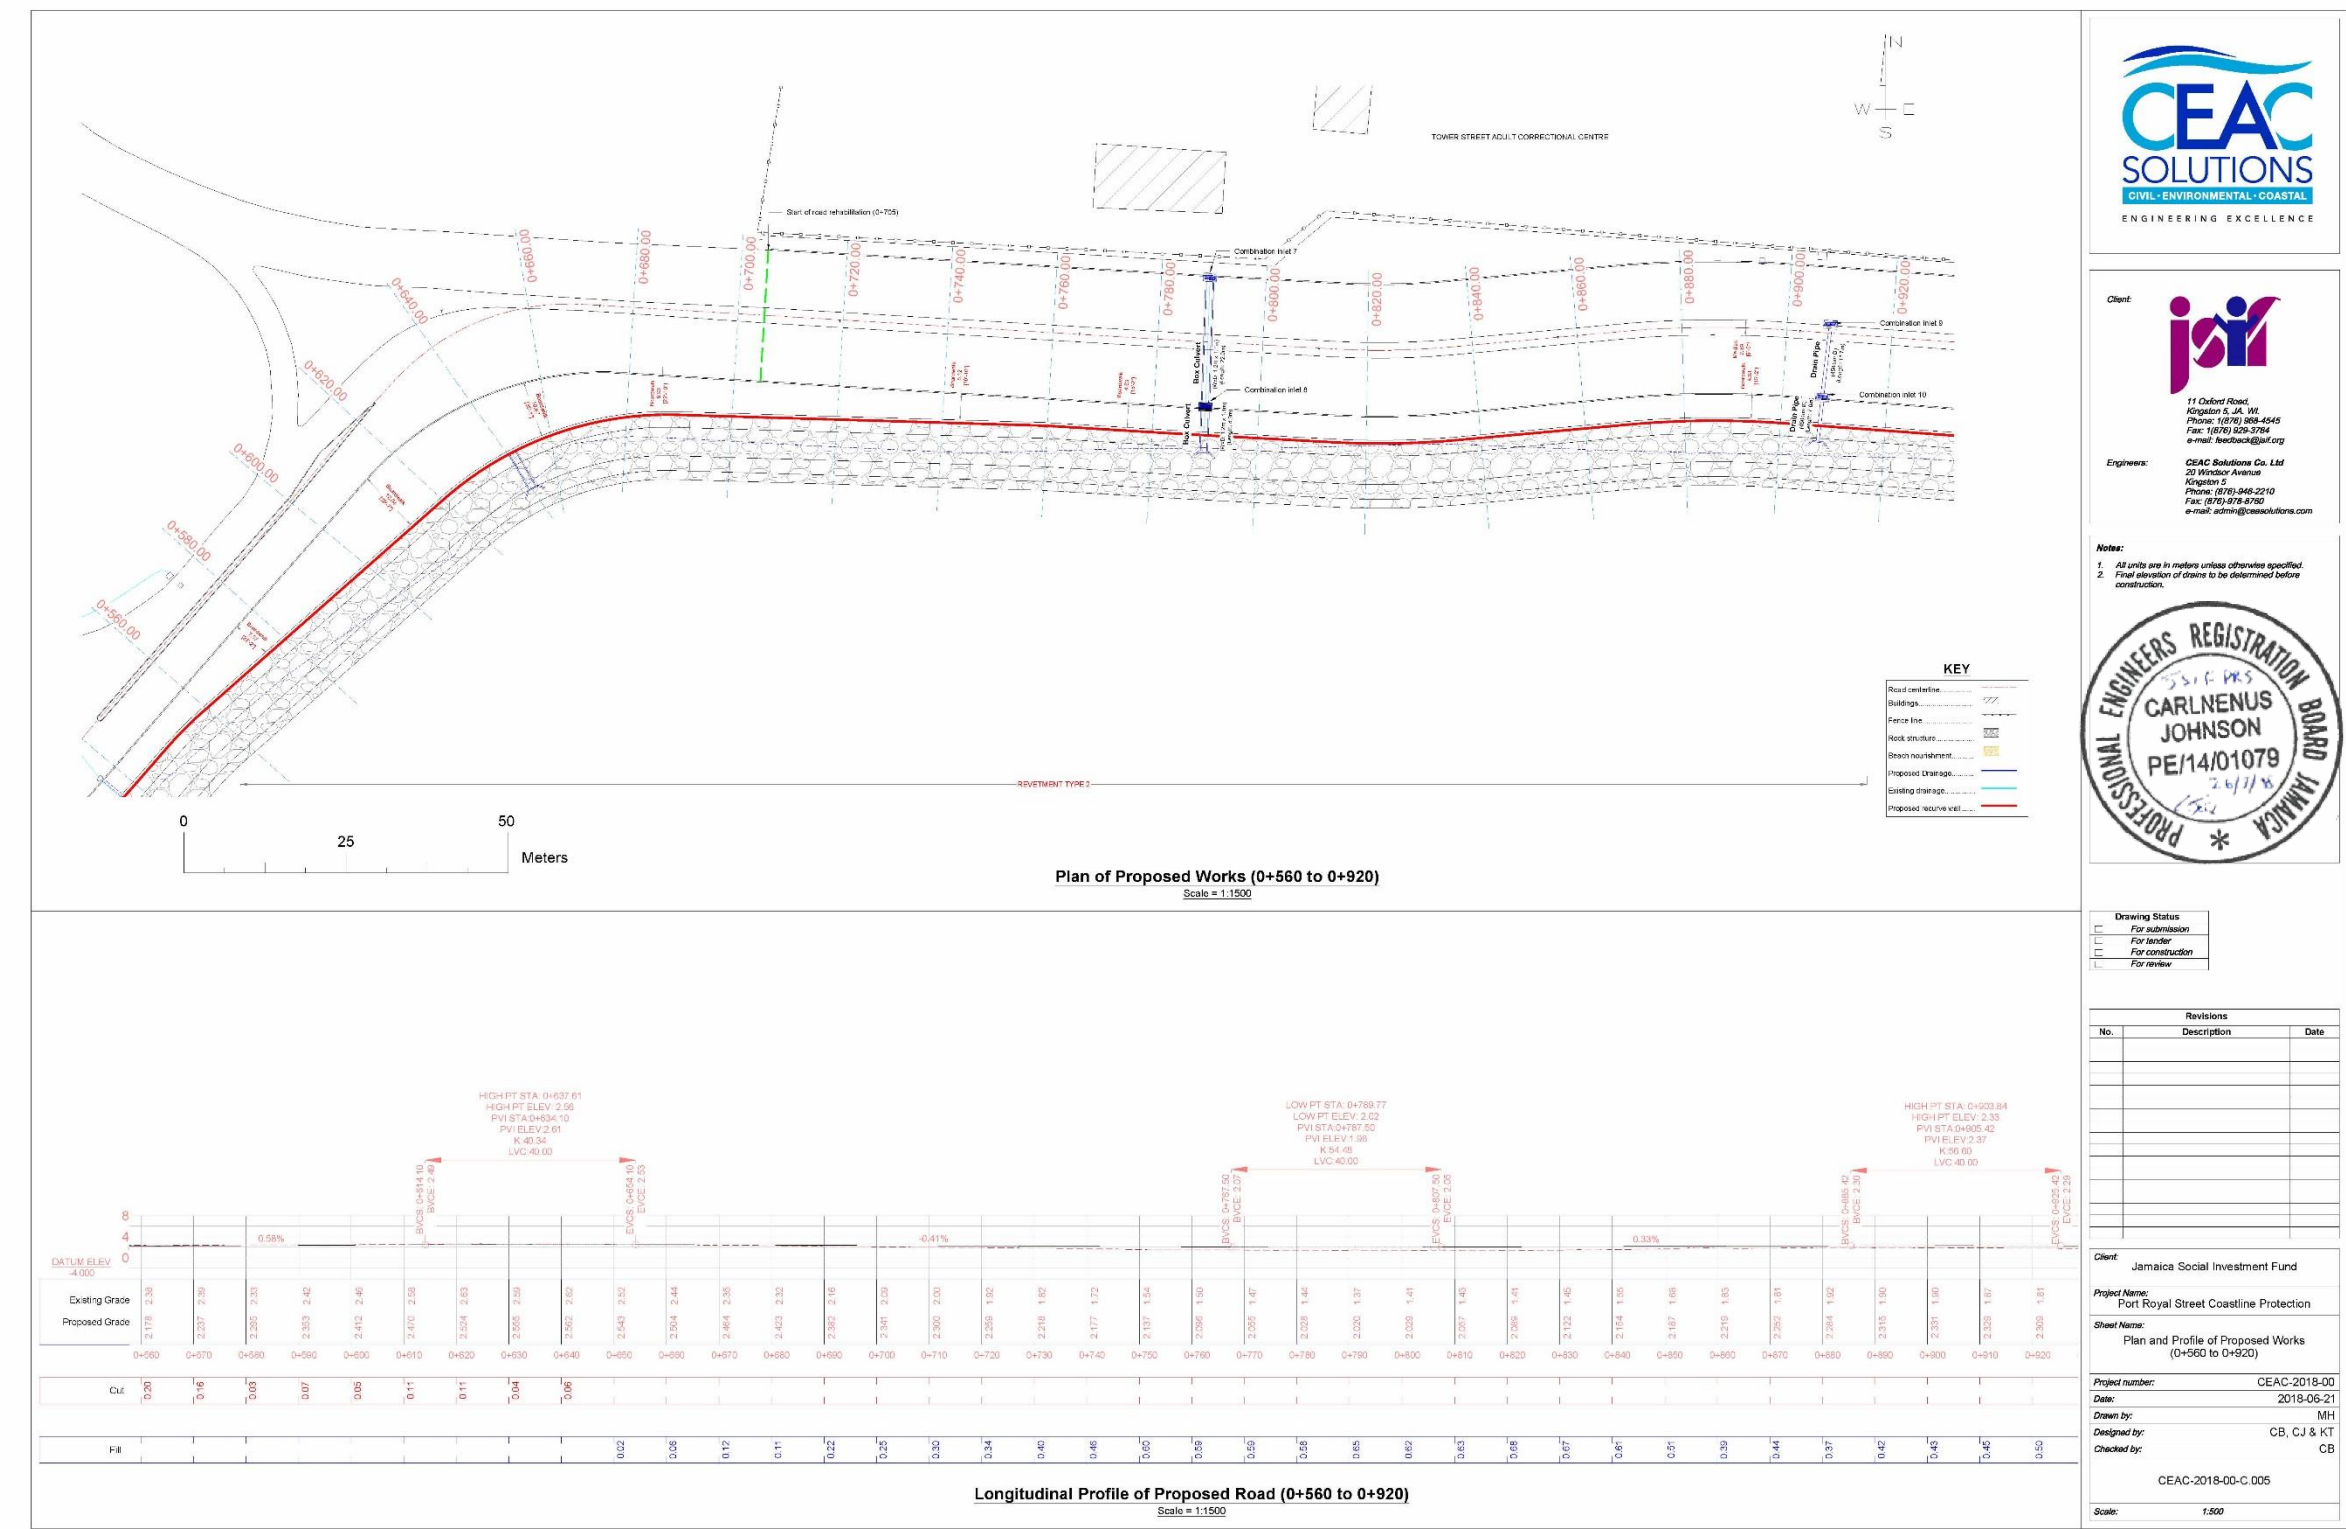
Plan and Profile of Proposed Works (0+560 to 0+920)
